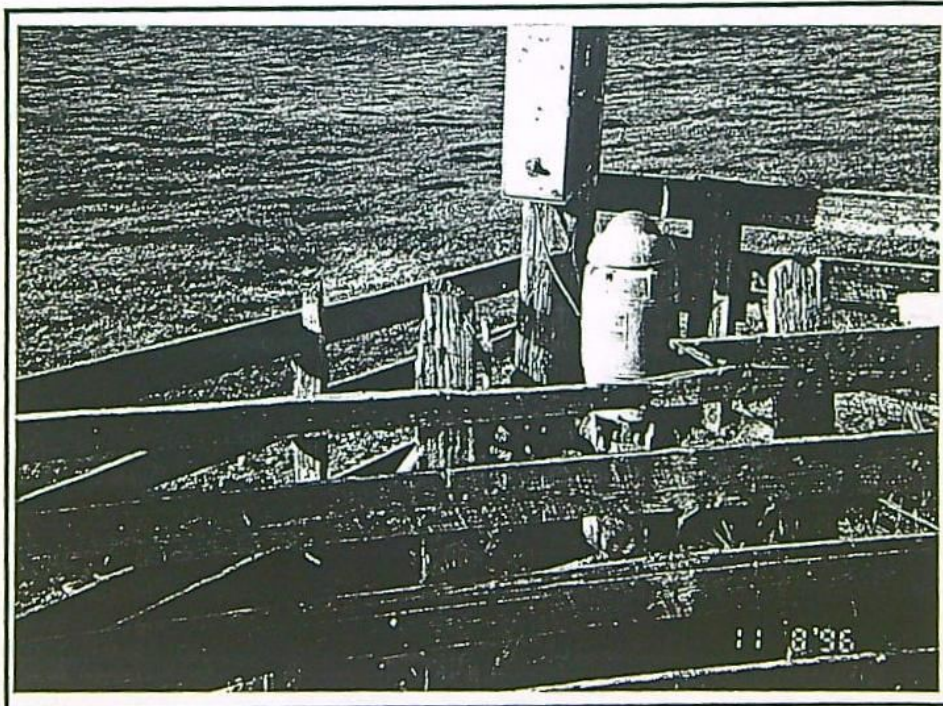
Well in the NW 1/4, NW 1/4 of Section 25.
